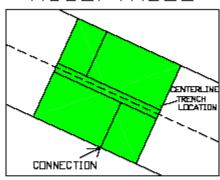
Example 12: Damaged pavement within 10 feet of a patch must also be patched.
